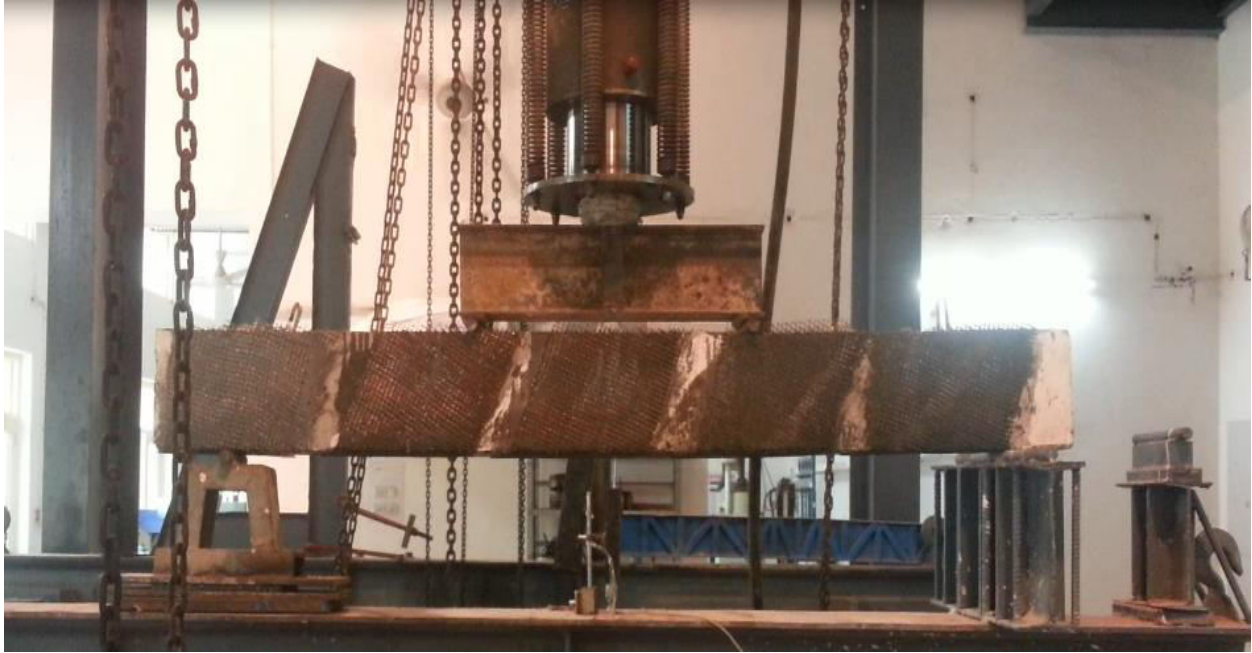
Test Setup for Beam Strengthened with Arrangement-II
